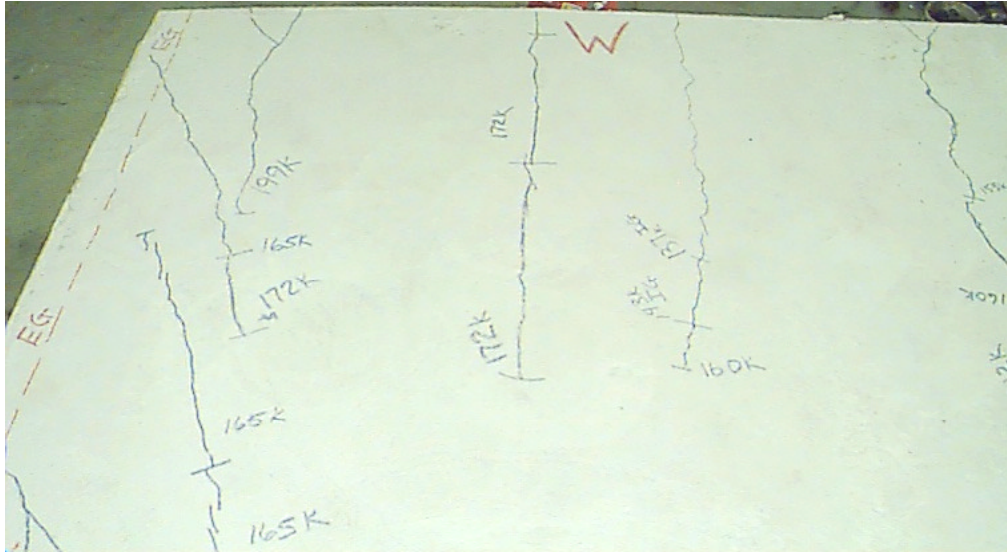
West End Slab Cracking Over EB (FF-2)
